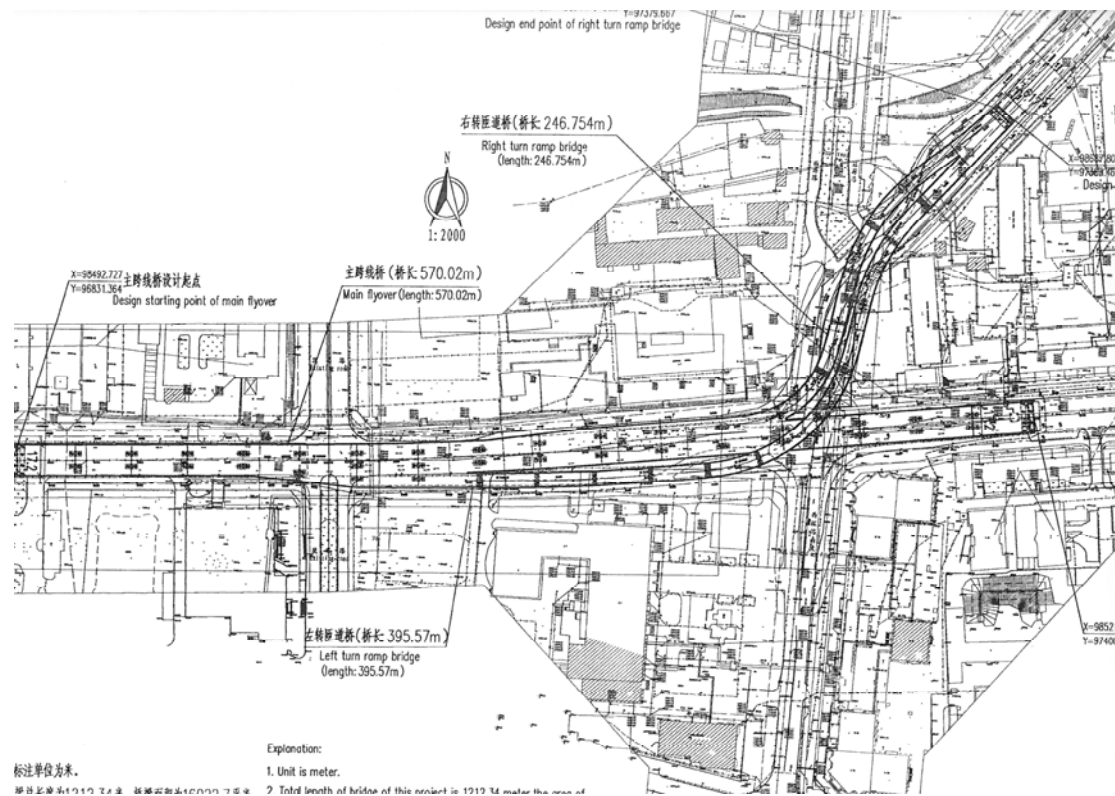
Flyover Project at East Intersection (Plan)
